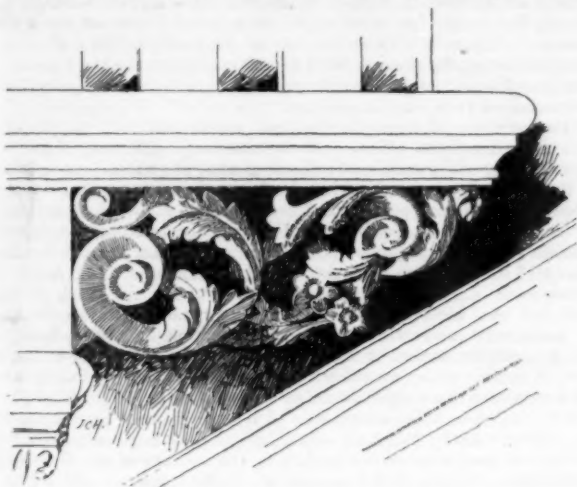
Stair String, Carter's Grove, Va., 1737.
